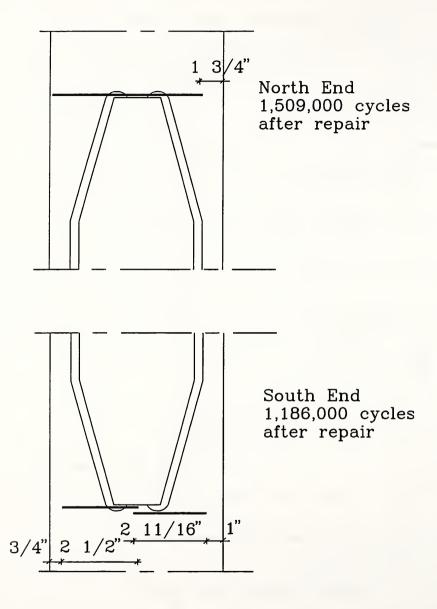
Crack Shape - Specimen NR5. (End of Test)
